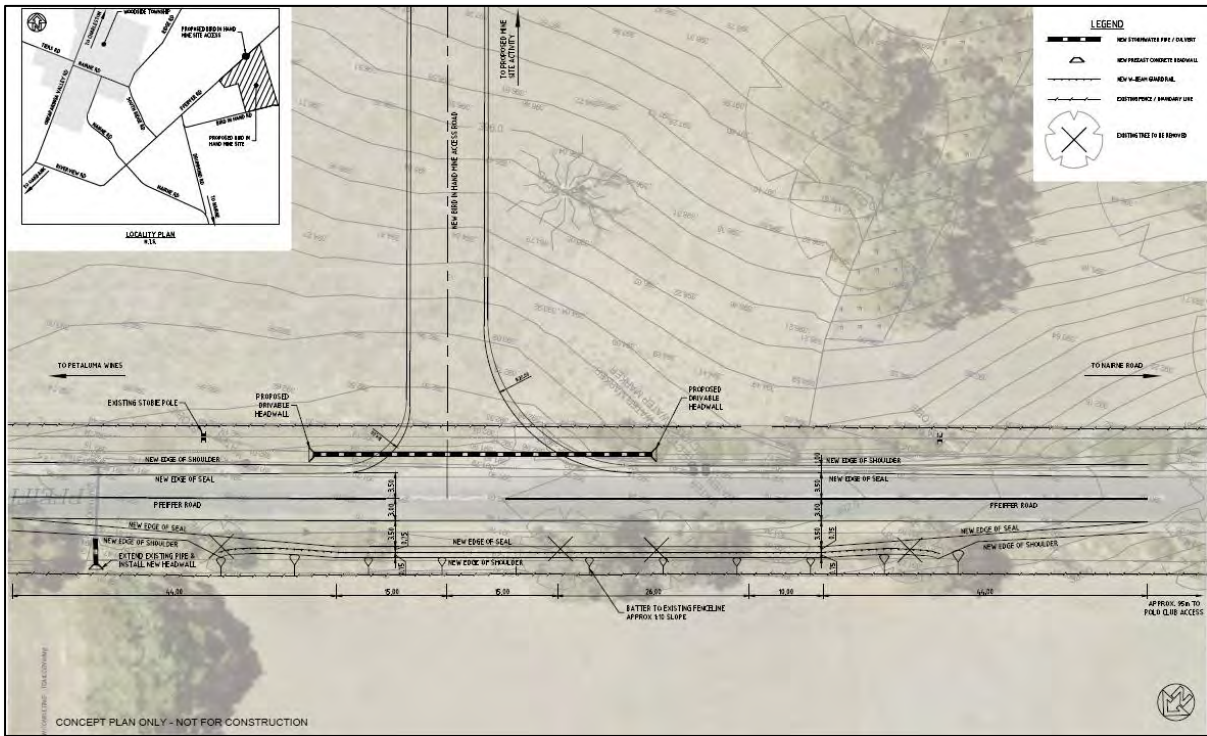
| PROPOSED SITE ACCESS AND ADDITIONAL PASSING LANE (APPENDIX F1)
